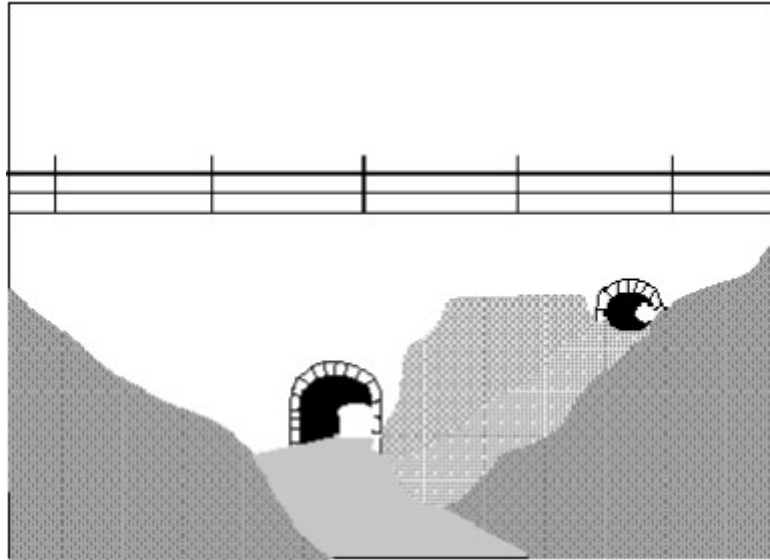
Culvert with undepass with a path leading from the stream to the entrance (Design manual for roads and bridges, 2001)
